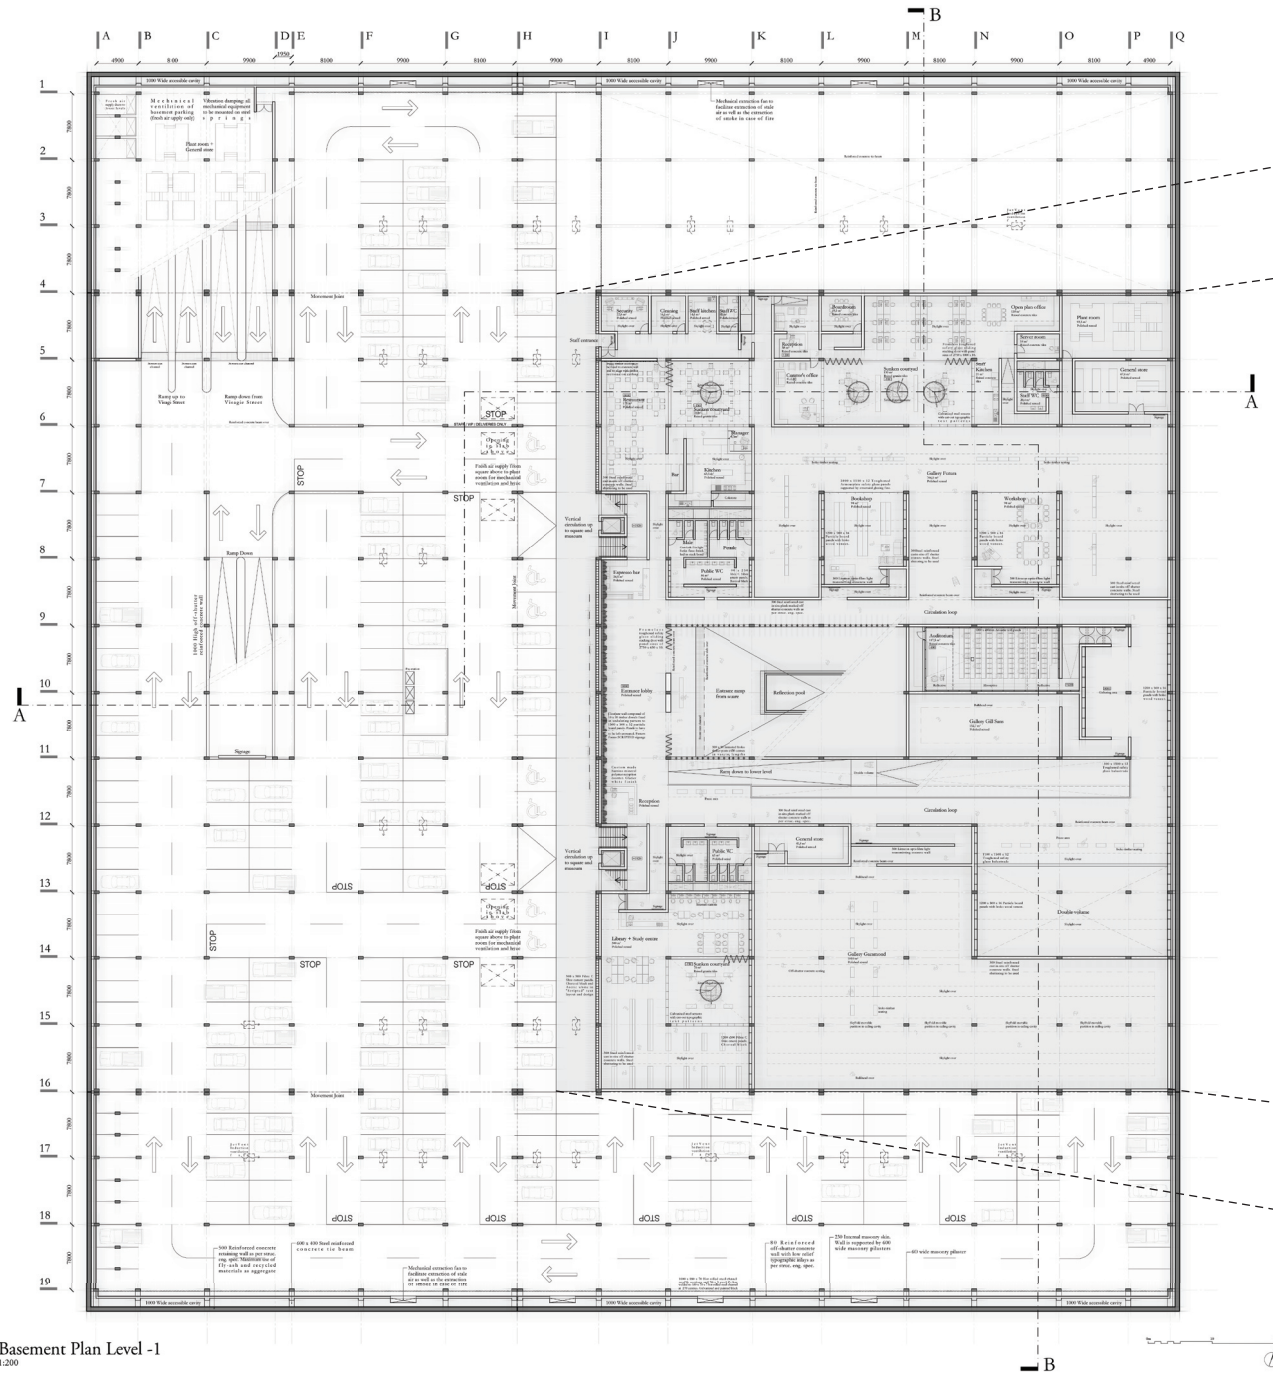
First subterranean floor of proposed new precinct . Not to scale (Author, 2011).
